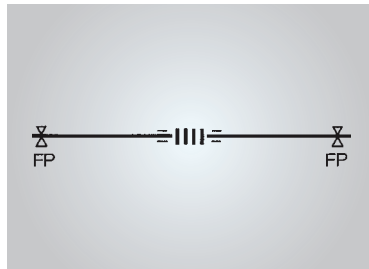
Straight pipe run with axial expansion joint and end anchors
